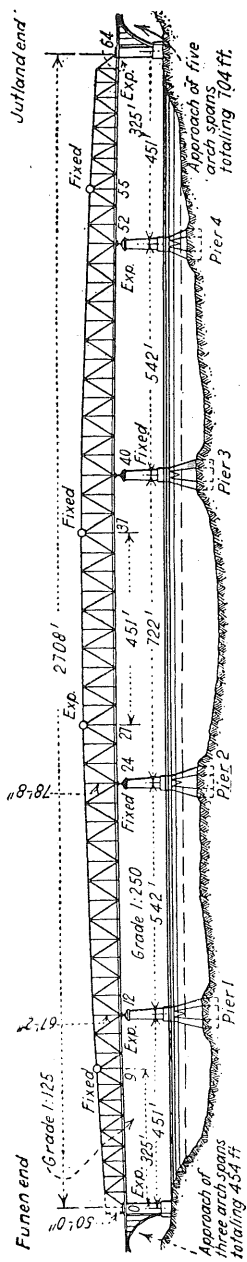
GENERAL DIMENSIONS OF BRIDGE FOR WHICH CAISSONS SHOWN IN FIG. 120 WERE USED.
